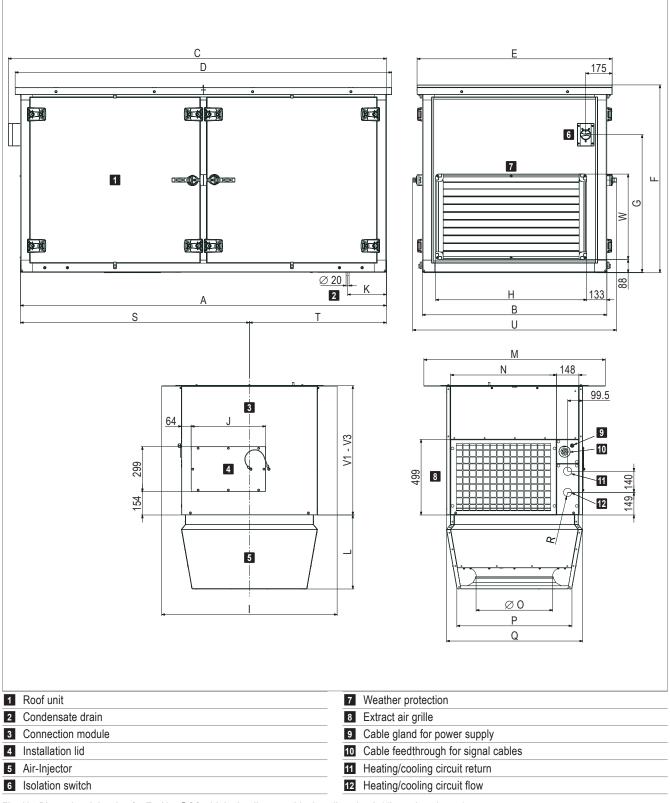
Dimensional drawing for TopVent® SC with hydraulic assembly throttling circuit (dimensions in mm)
